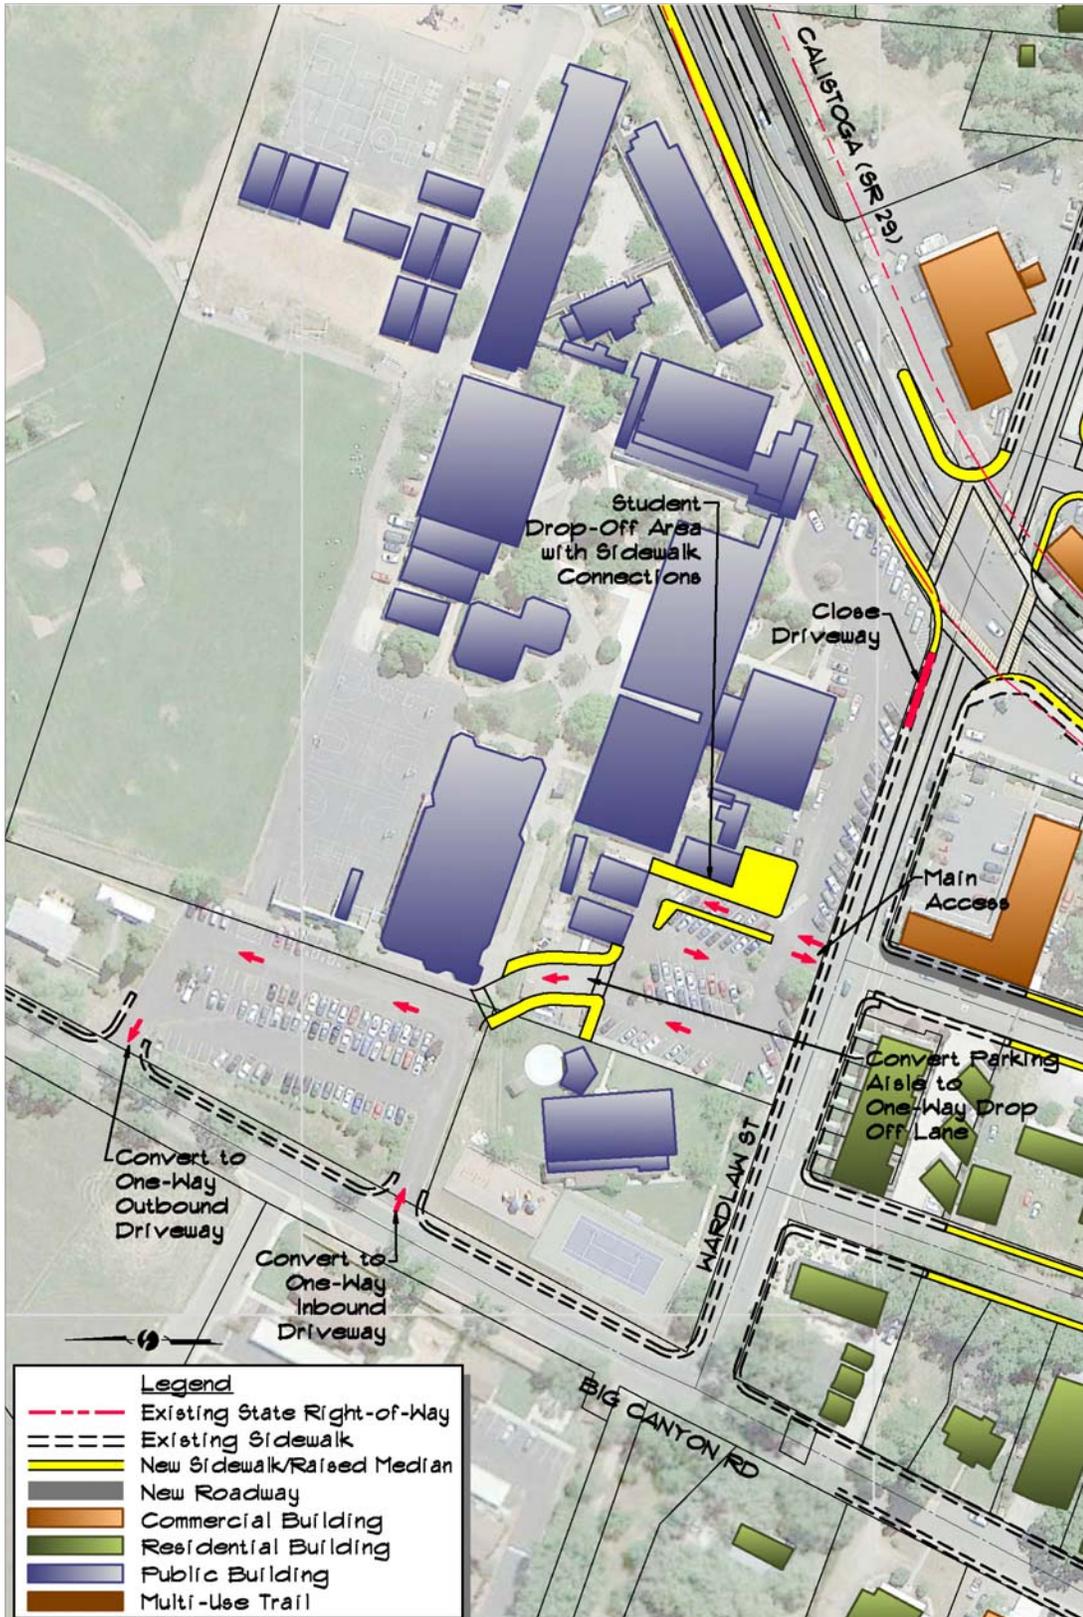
B - MIDDLETOWN HIGH SCHOOL AND ELEMENTARY SCHOOL DRIVEWAY AND DROP-OFF AREA IMPROVEMENT PLAN - OPTION B
